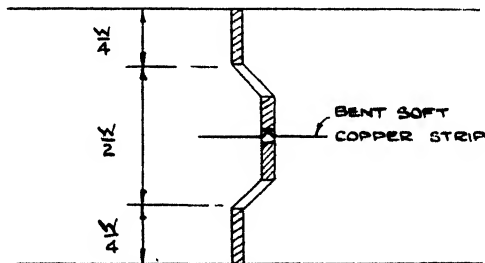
KEYED EXPANSION JOINT IN A TANK OR RESERVOIR WALL
